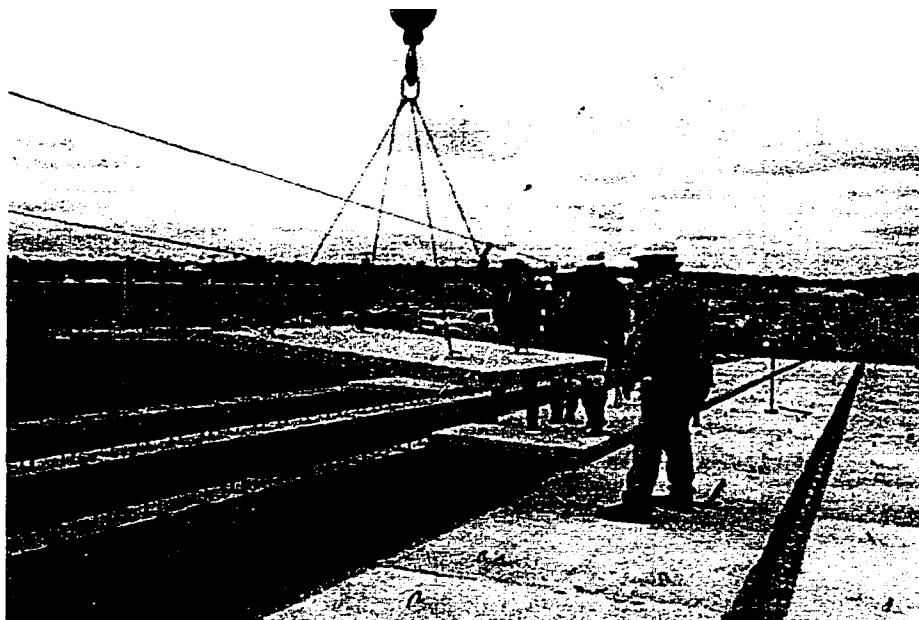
Erection of Precast Panels in the Westbound Bridge
